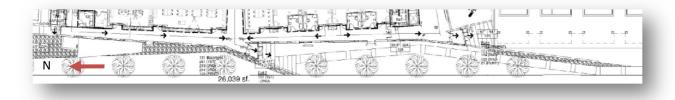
EXTERIOR PLAN VIEW OF THE WESTERN FACADE
